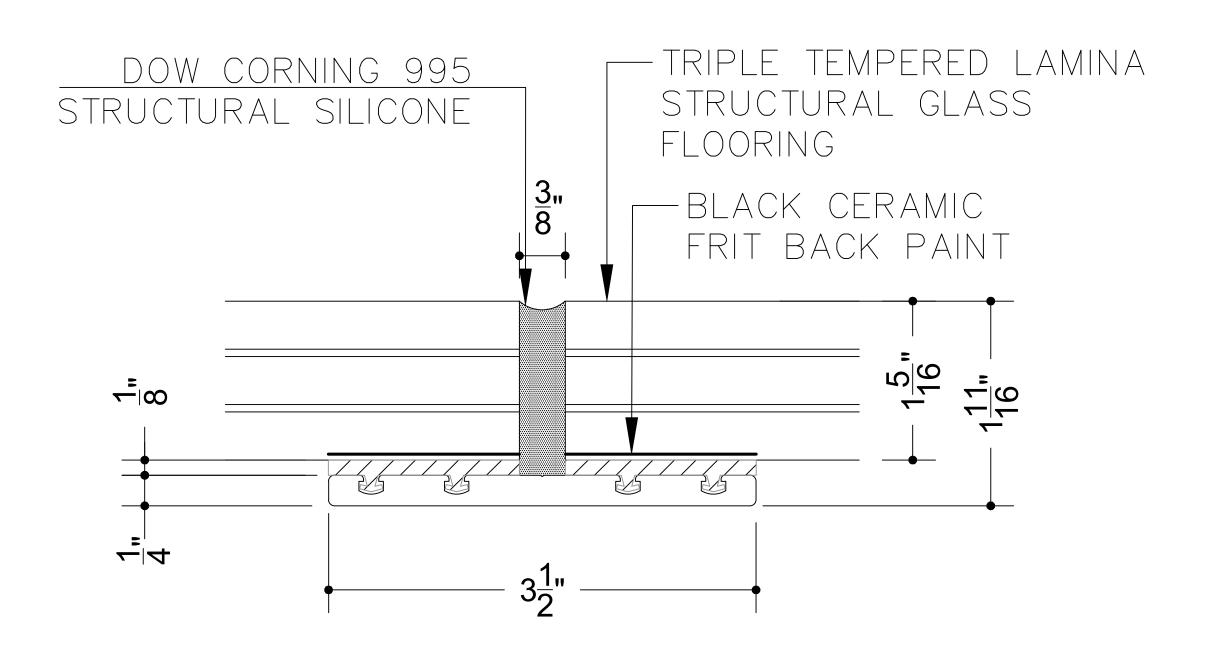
SKYFLOOR® MODULAR GLASS DECK PERIMETER
